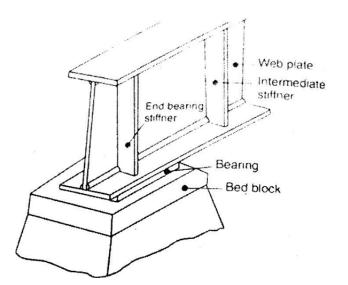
Important Components of Plate Girder (Source: Design of Bridge Structures by T.R. Jagadeesh & M.A. Jayaram)
